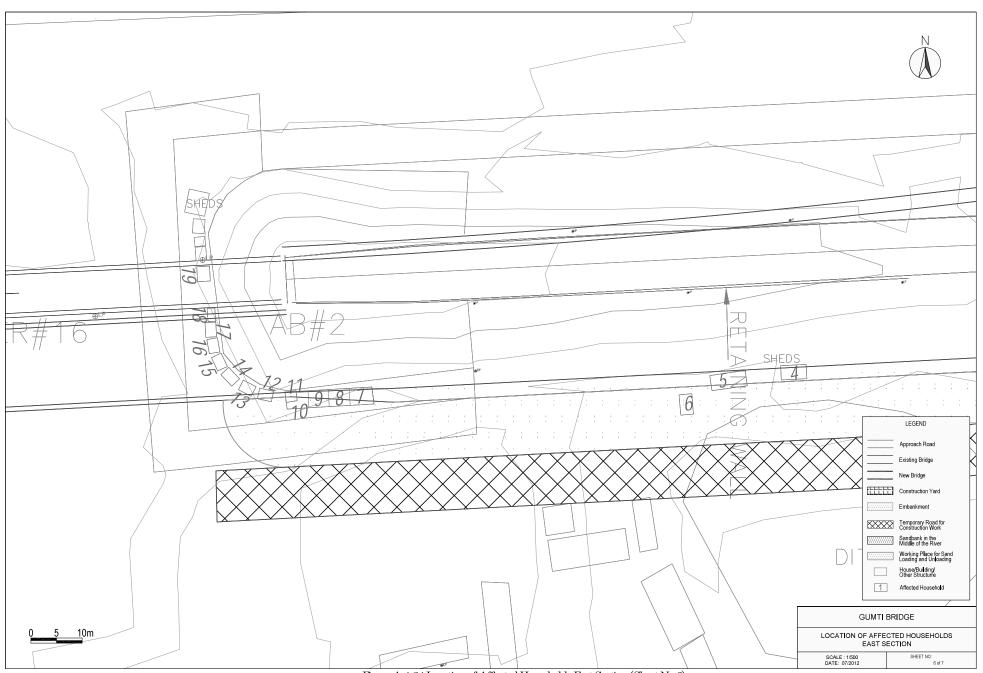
Location of Affected Households East Section (Sheet No.6)
